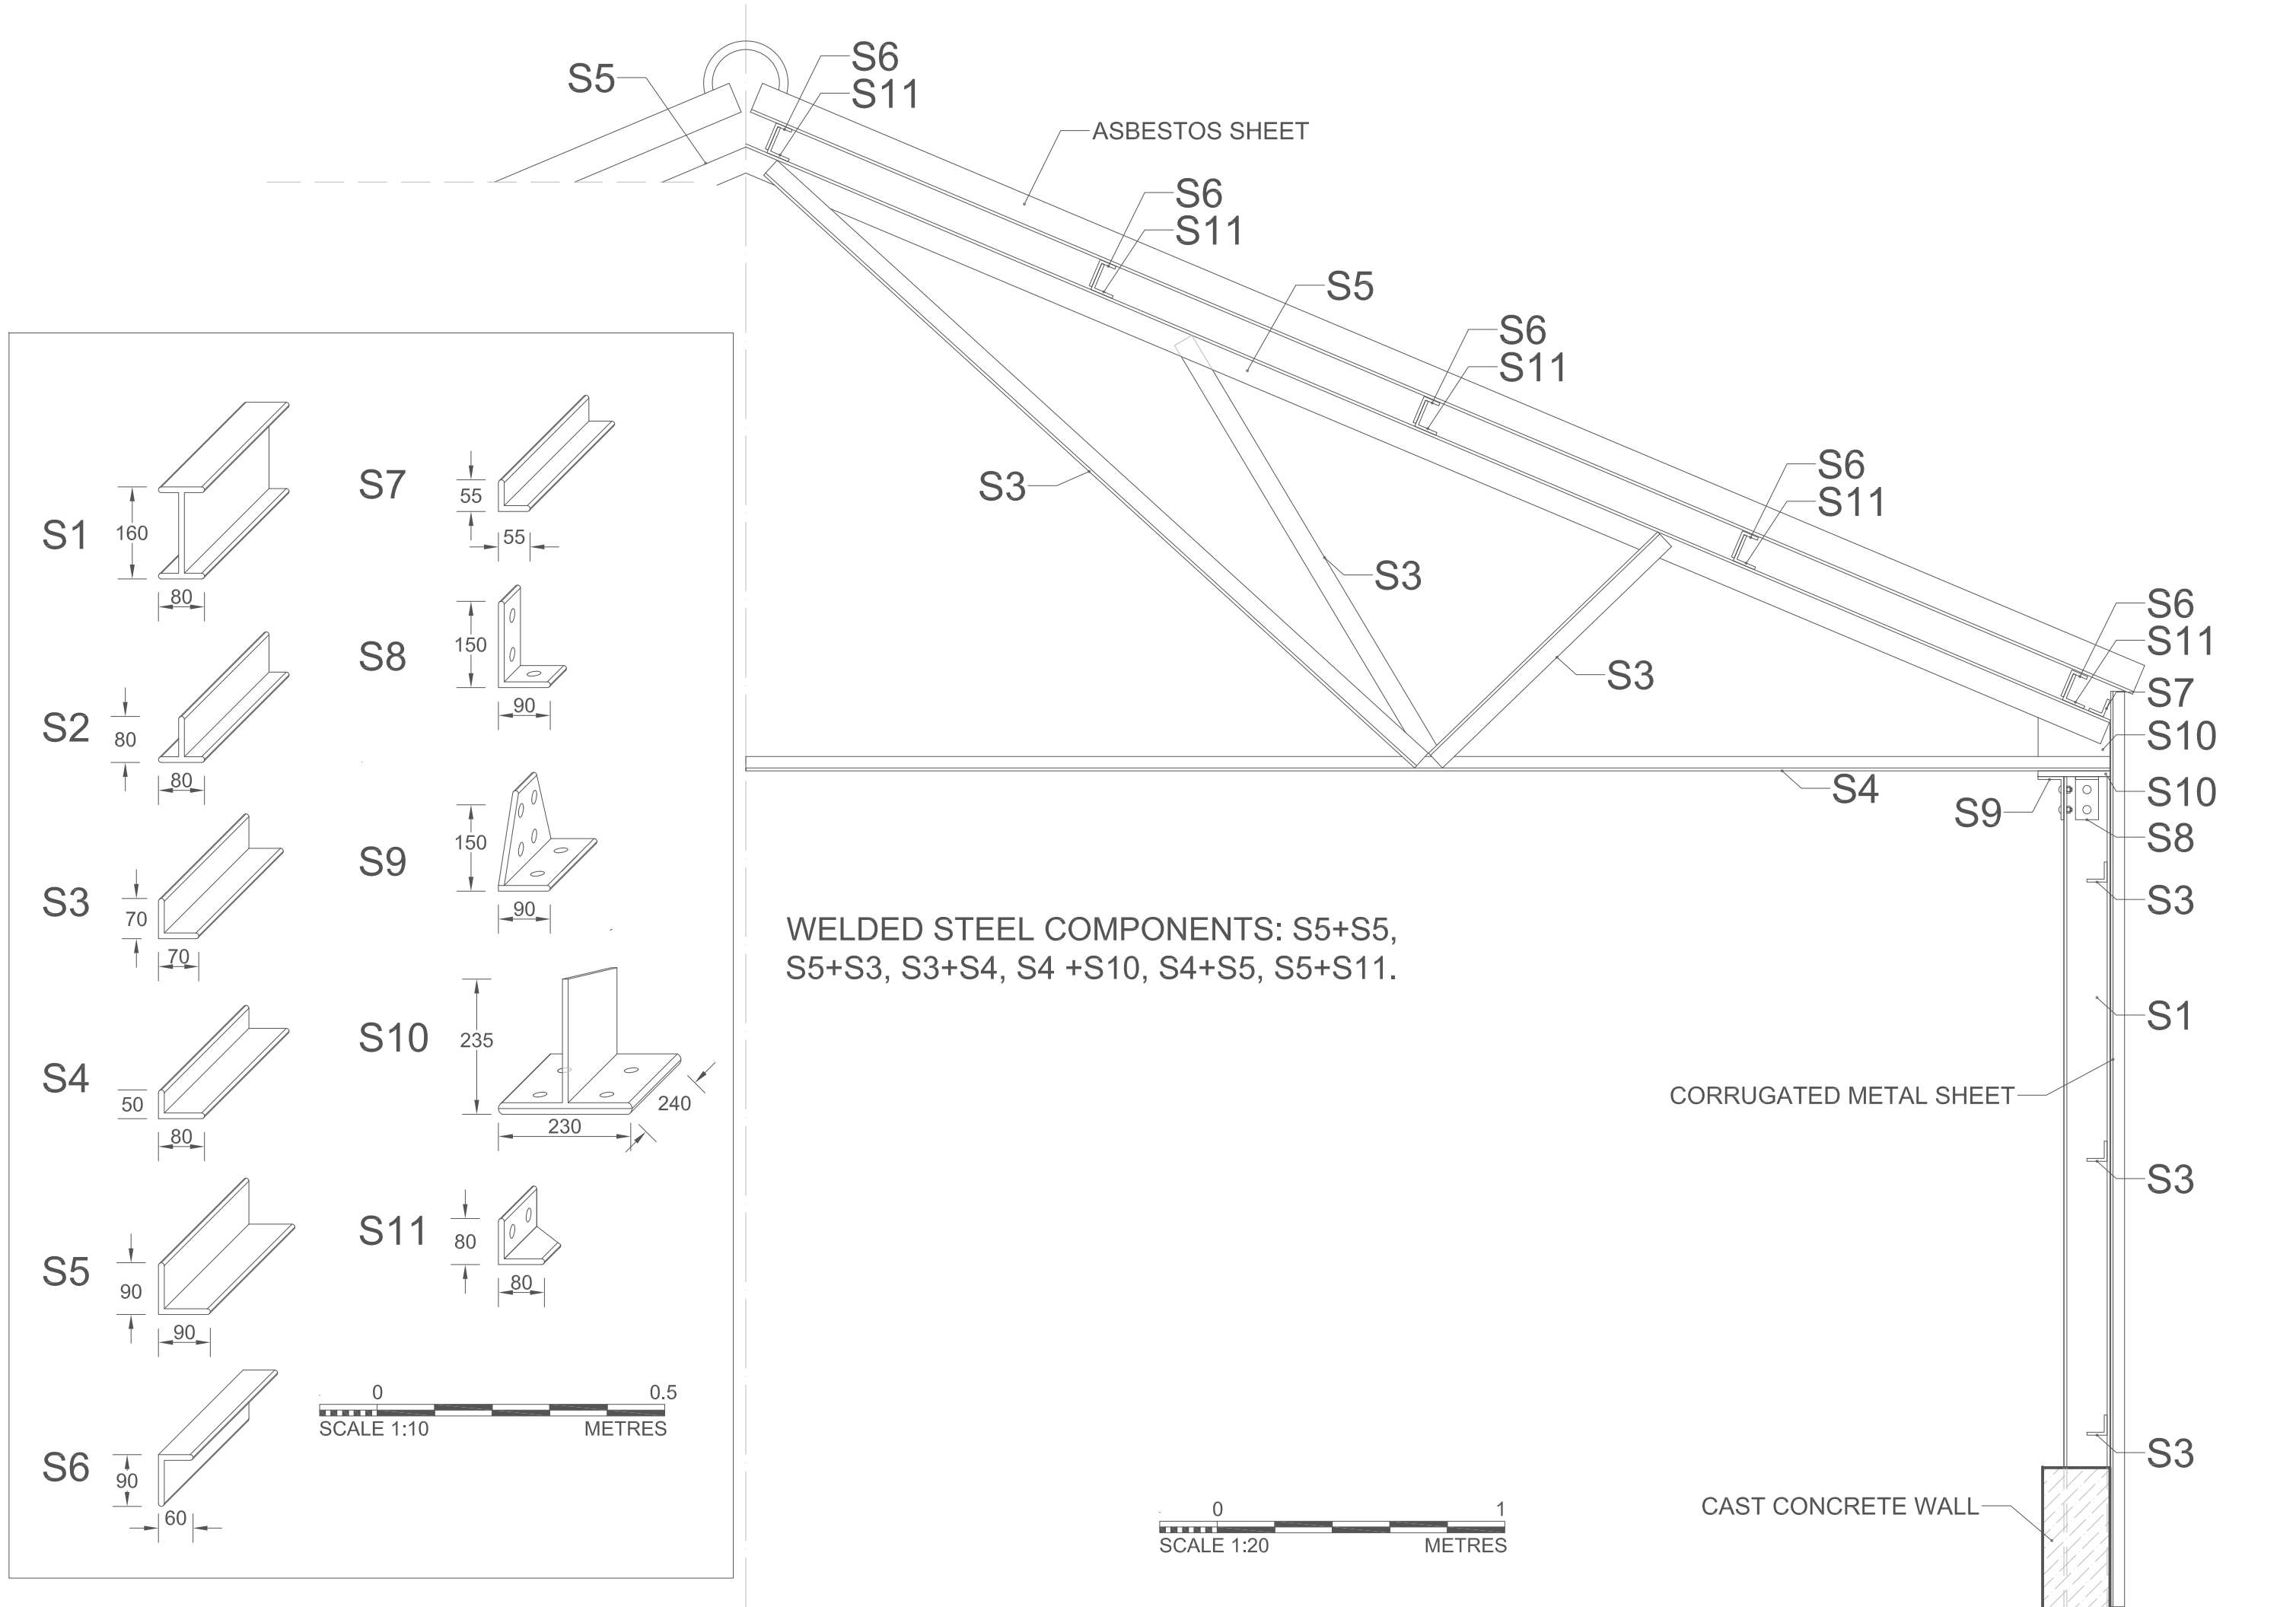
Section through steel frame and profiles of steel components of Locomotive Shed, building number 66.
